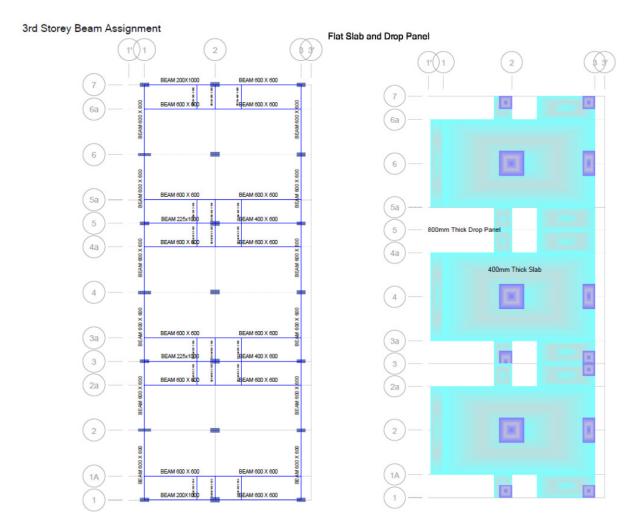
Plan layout with beam/slab section properties in design calculations
